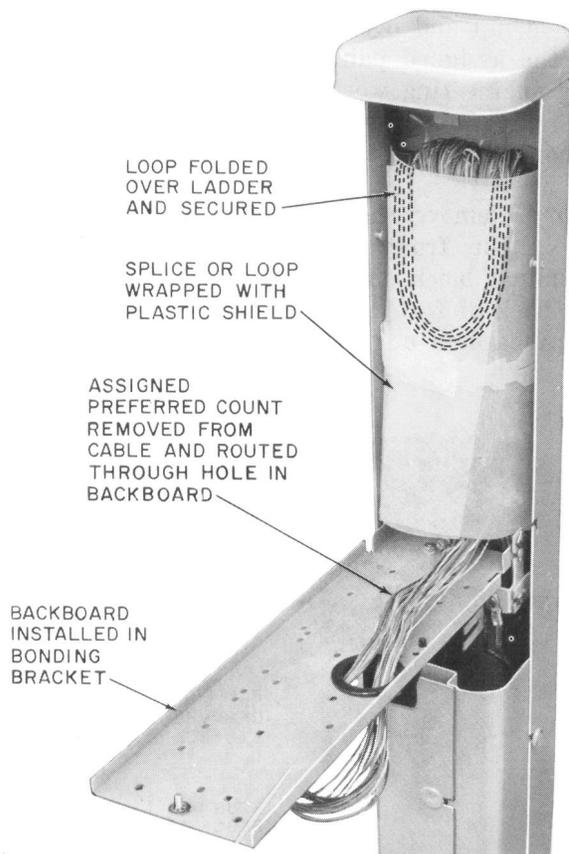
Installed Backboard in PC6/48 Cable Closure—Typical for PC12/55 Cable Closure
